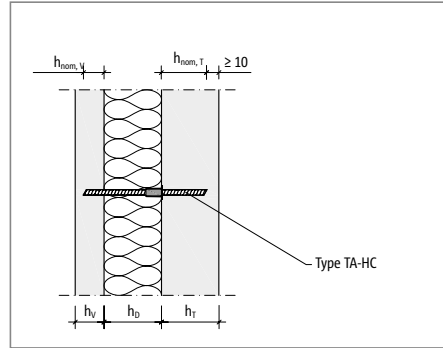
Schöck Isolink® type TA-HC: Cross-section details for the sandwich wall;  $h_{nom,V} < h_v$
